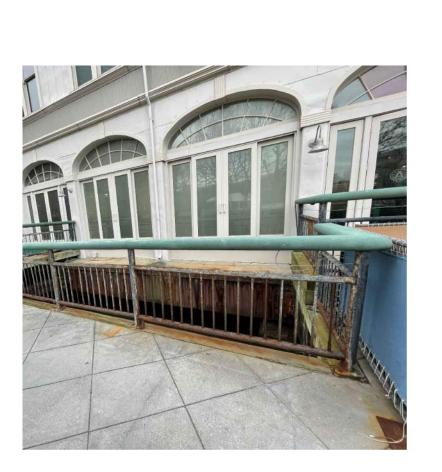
OPEN AREA #4 CORRODED HANDRAILS
